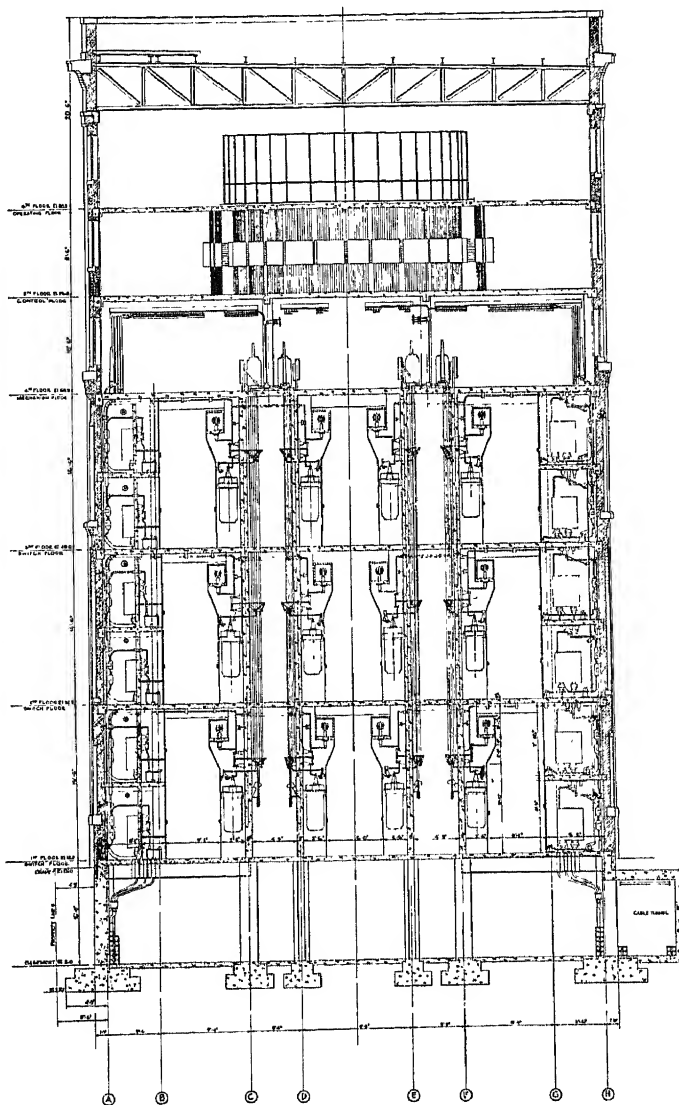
CROSS-SECTION OF SWITCH HOUSE
